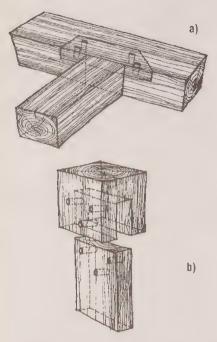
Two simple repairs to historic joints, a) a replaced mortise wall; and b) a new tenon.
